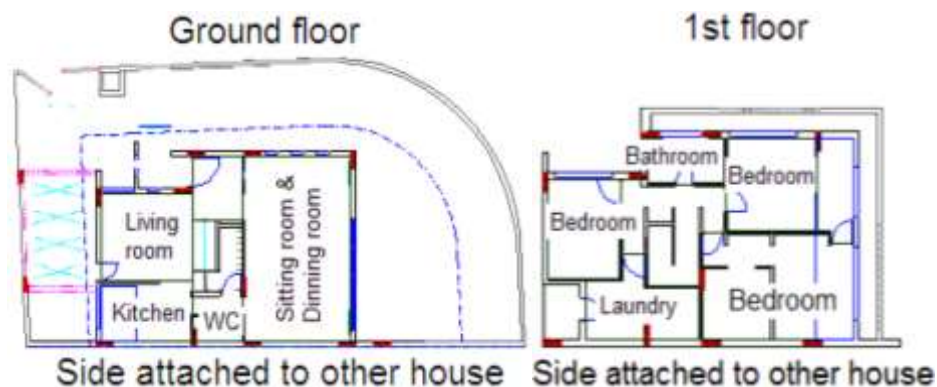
Plan views of the typical house used for the estimation of the heating and cooling load (Pouloupatis, 2014)
